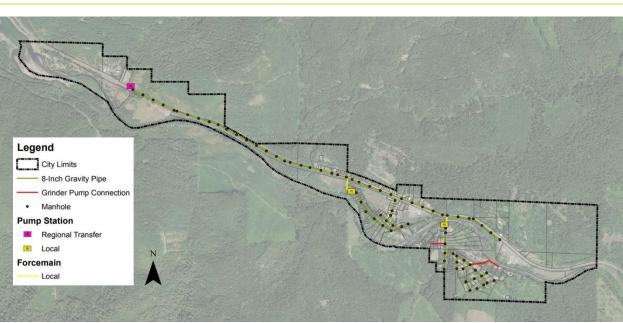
IDANHA GRAVITY COLLECTION SYSTEM
